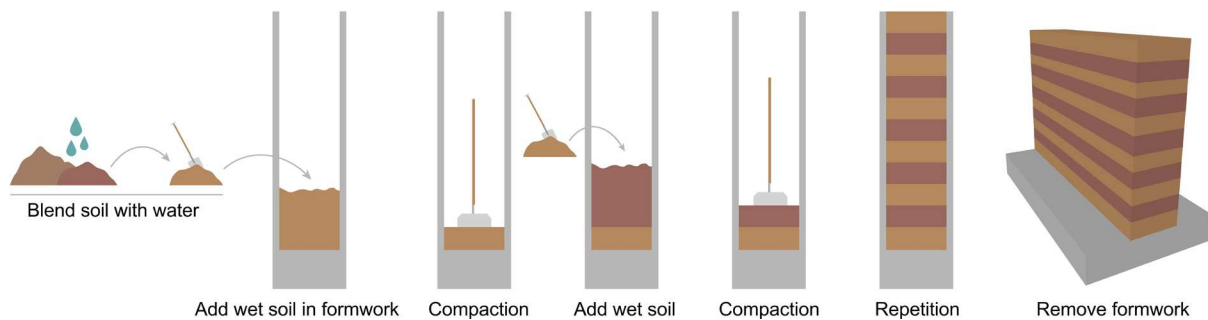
A scheme for the construction of a wall with the rammed earth technique
